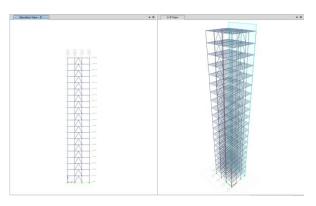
Elevation and 3D view of the building with inverted V bracings at center bay.
